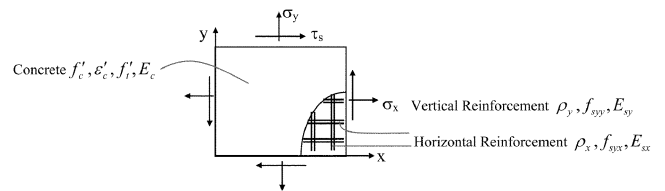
A reinforced concrete membrane element subject to in-plane stresses.
